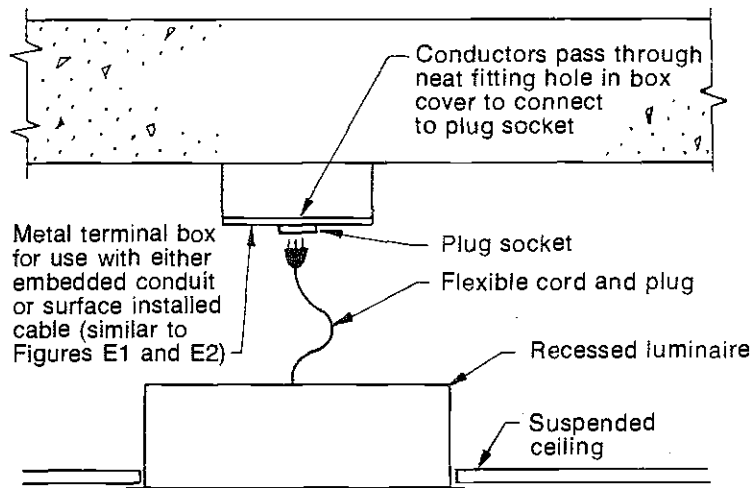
TYPICAL LAYOUT OF TERMINAL BOX AND RECESSED LUMINAIRE
